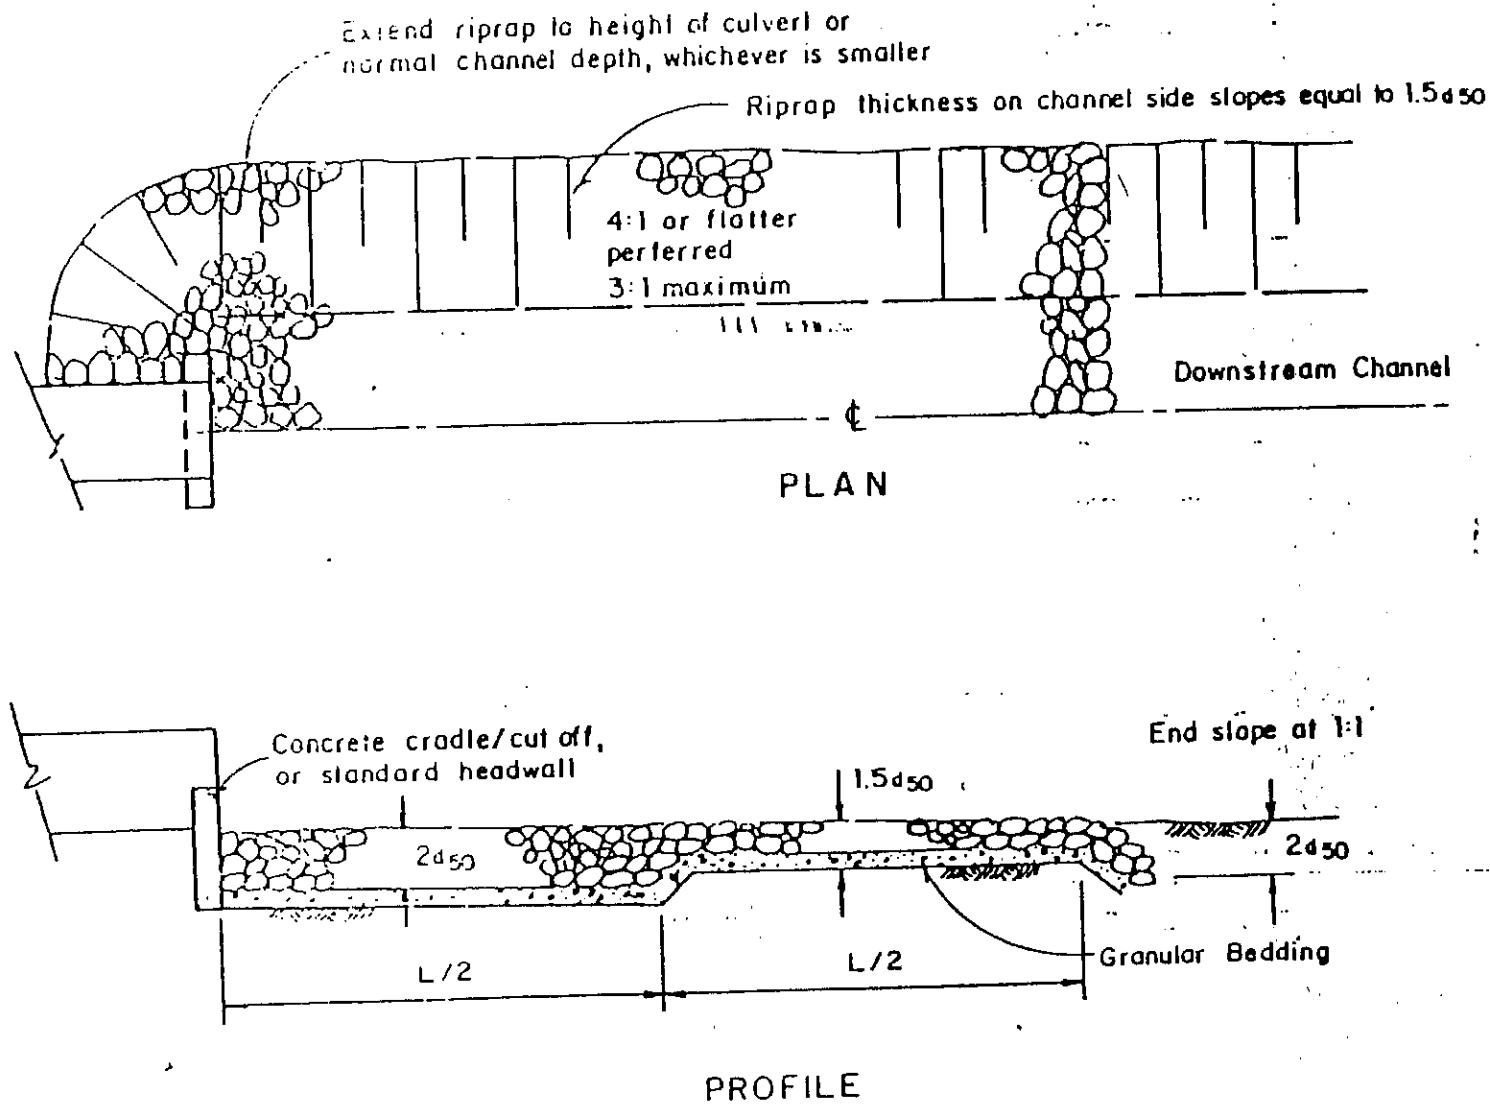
CONDUIT OUTLET EROSION PROTECTION
